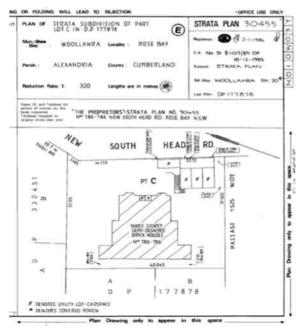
Current Hillcrest Site (Lot) Plan – S.P. 30455
